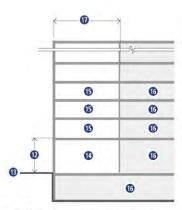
Shopfront Building: Floor-to-Floor Height & Use Requirements
